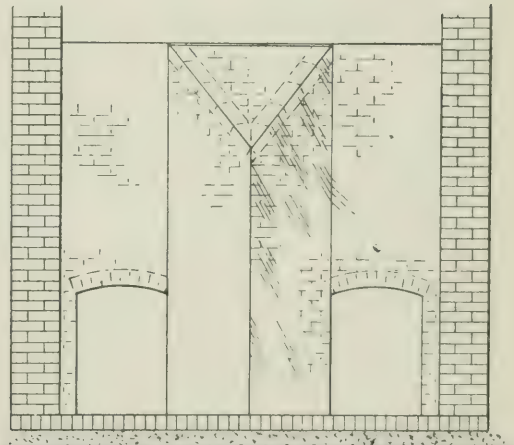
PLAN OF WOOLLEY FURNACE SHOWN IN FIG. 17.
